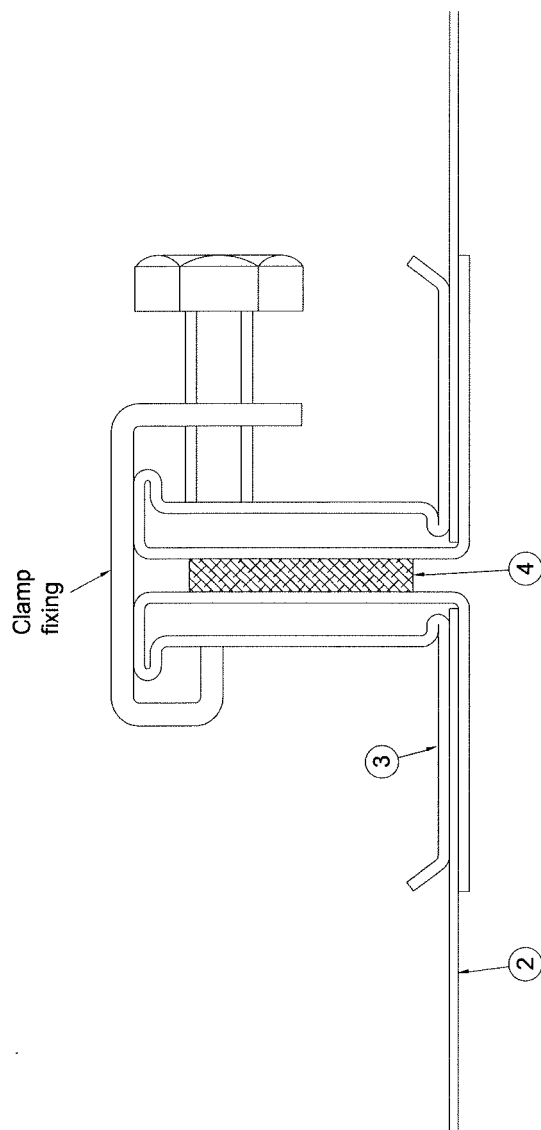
Typical detail of vertical assembly duct jointing
